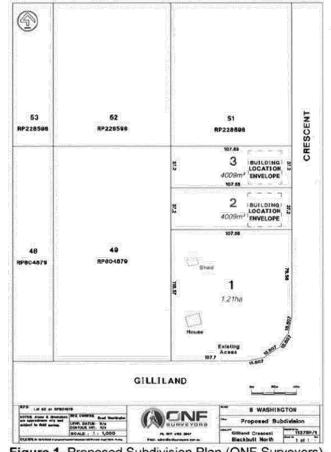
Proposed Subdivision Plan (ONF Surveyors).
